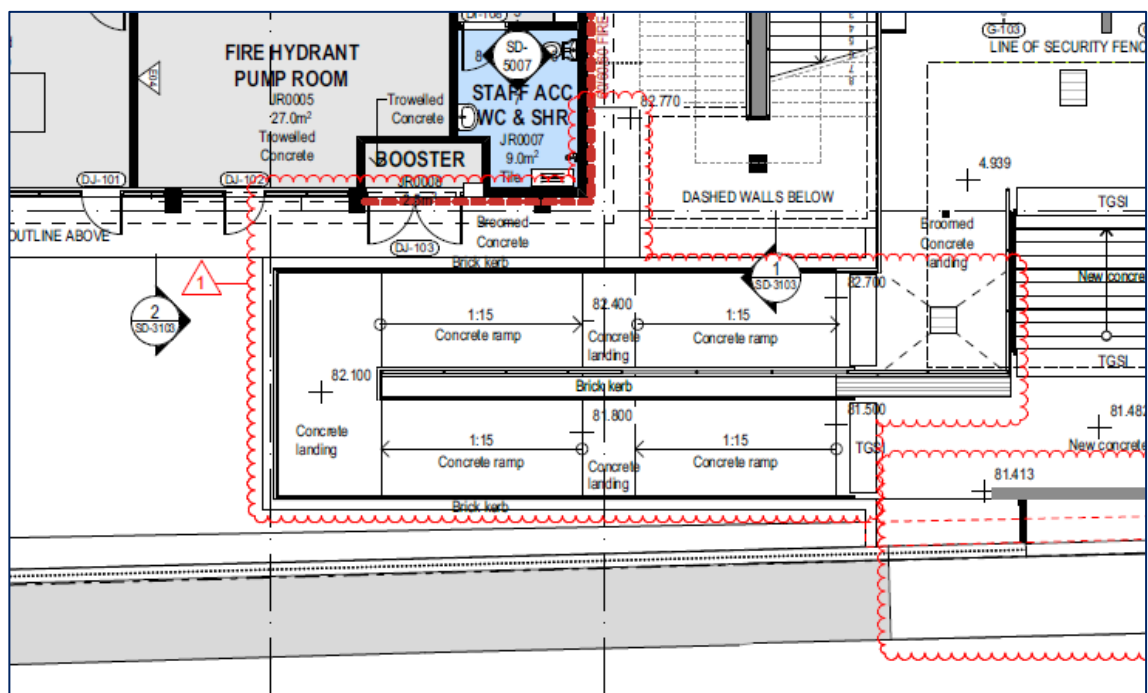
| Proposed ramp reconfiguration (Source: Applicant's Modification Application 2022)
